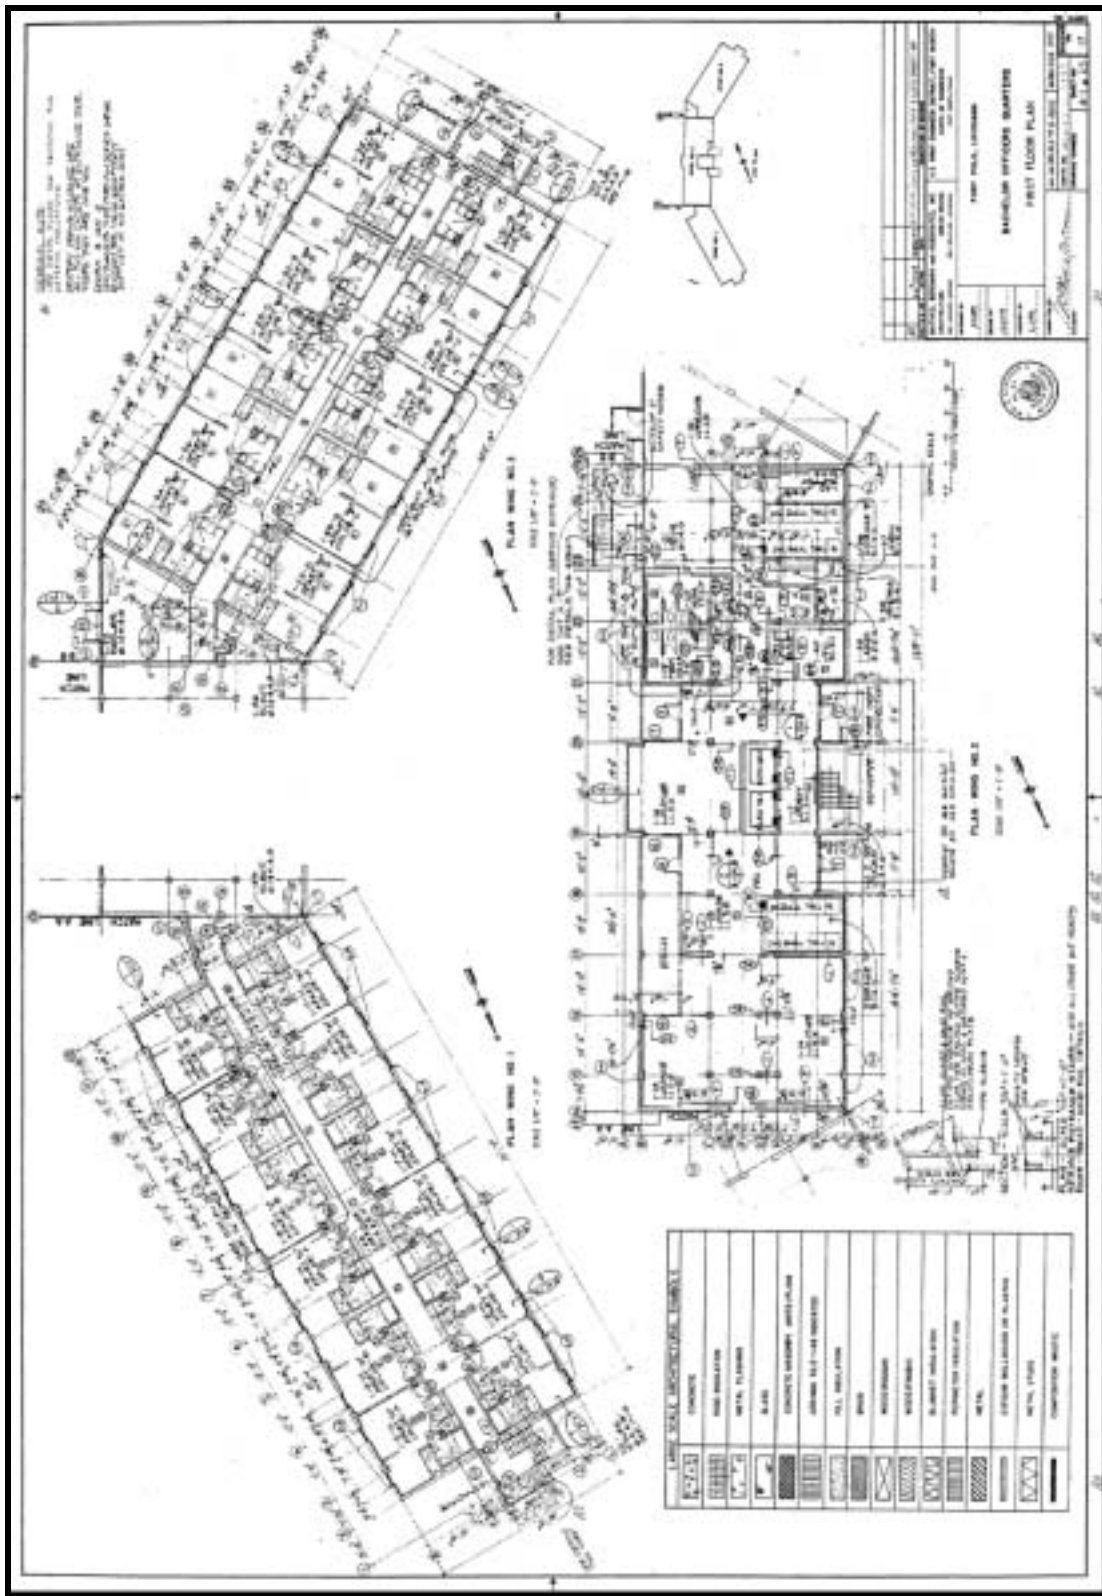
High Rise BOQ, Woodfill Hall, first floor plan, Ft. Polk (1977, revised 1977) (Engineering, Ft. Polk).
